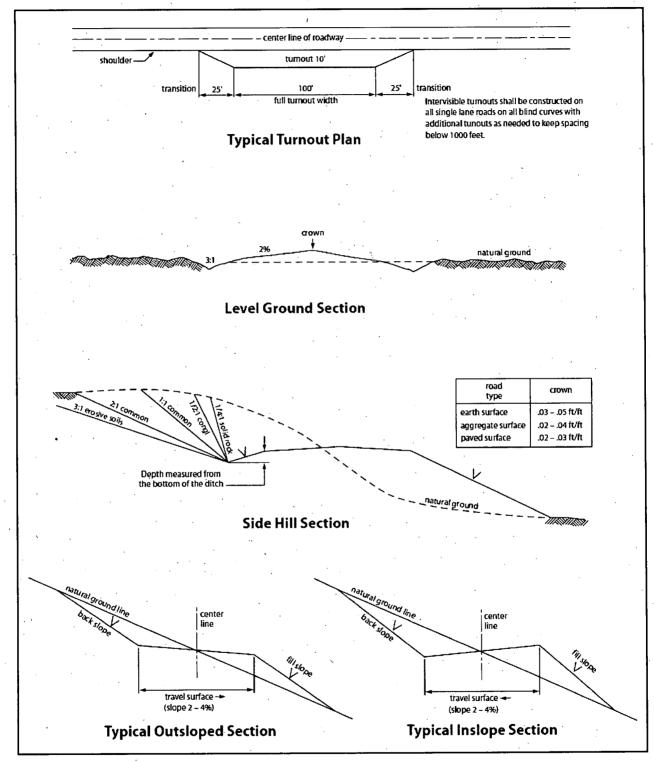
Cross-sections and plans for typical road sections representative of BLM resource or FS local and higher-class roads.
